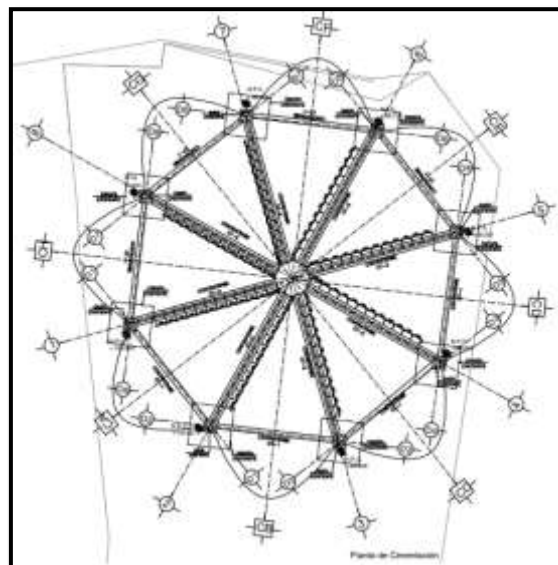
‘Los Manantiales’ foundation plan showing existing repaired footings and new radial tie-beams.
